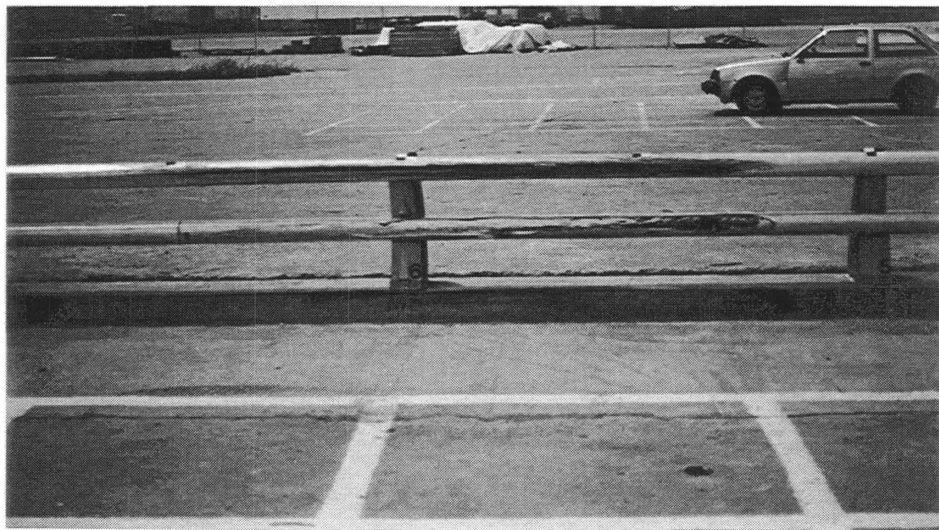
Bridge Rail Damage, Test FPAR-3.
